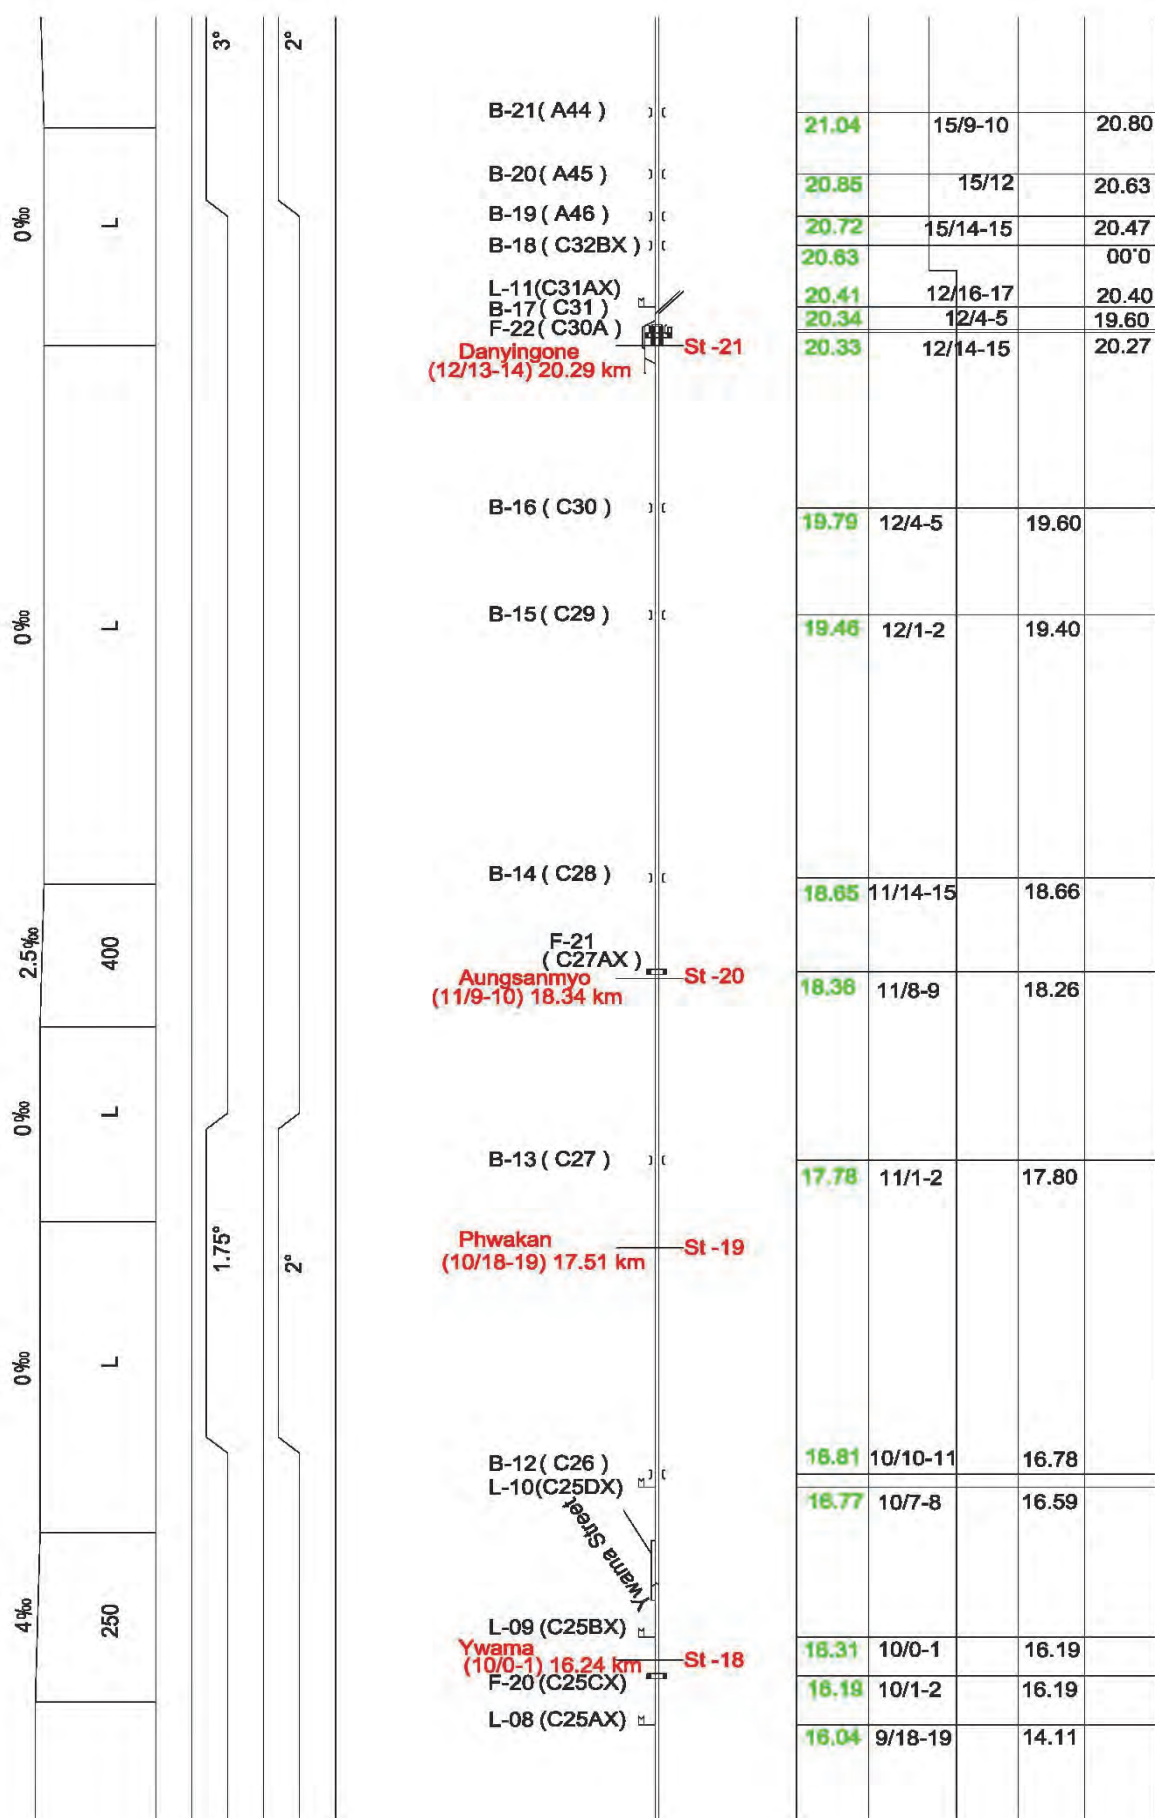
Schematic Sketch on Existing Yangon Circular Railway (4/9)
